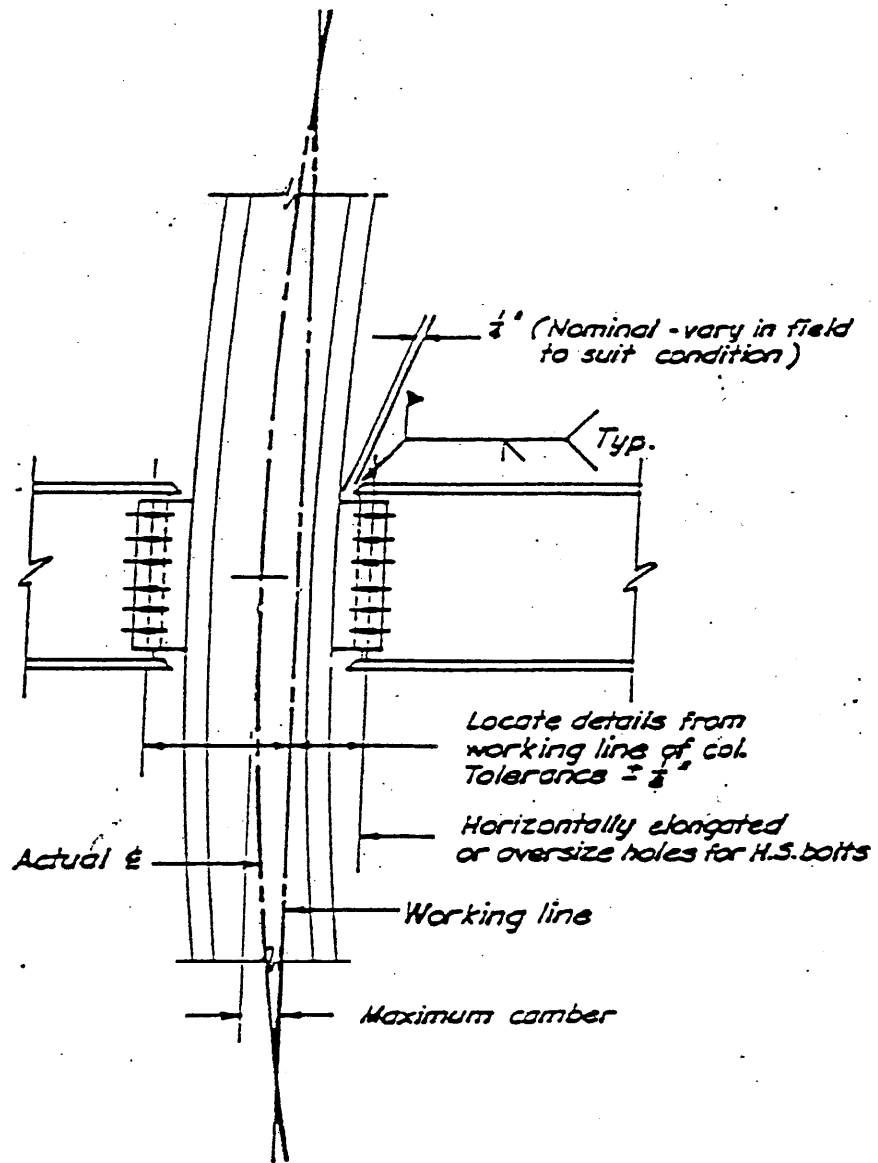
Adjustments for column camber in beam-to-column connections.
